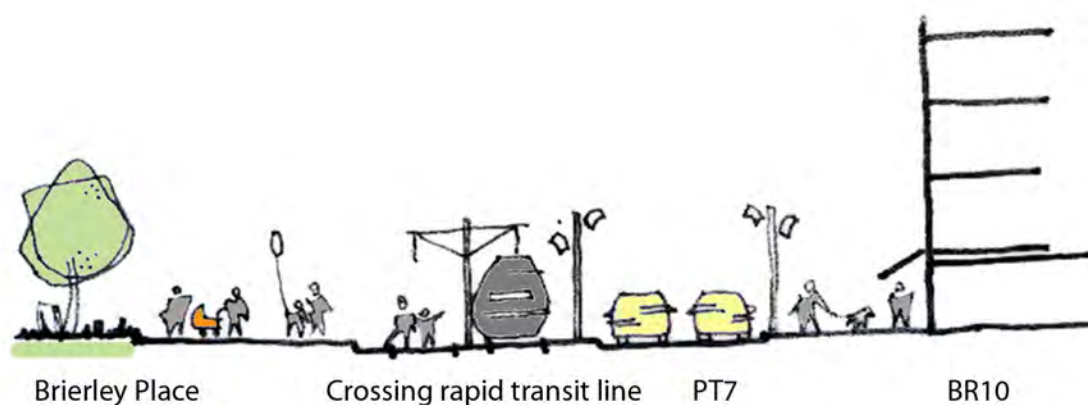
Cross Section Brierley Place (PT7 - BR10)
